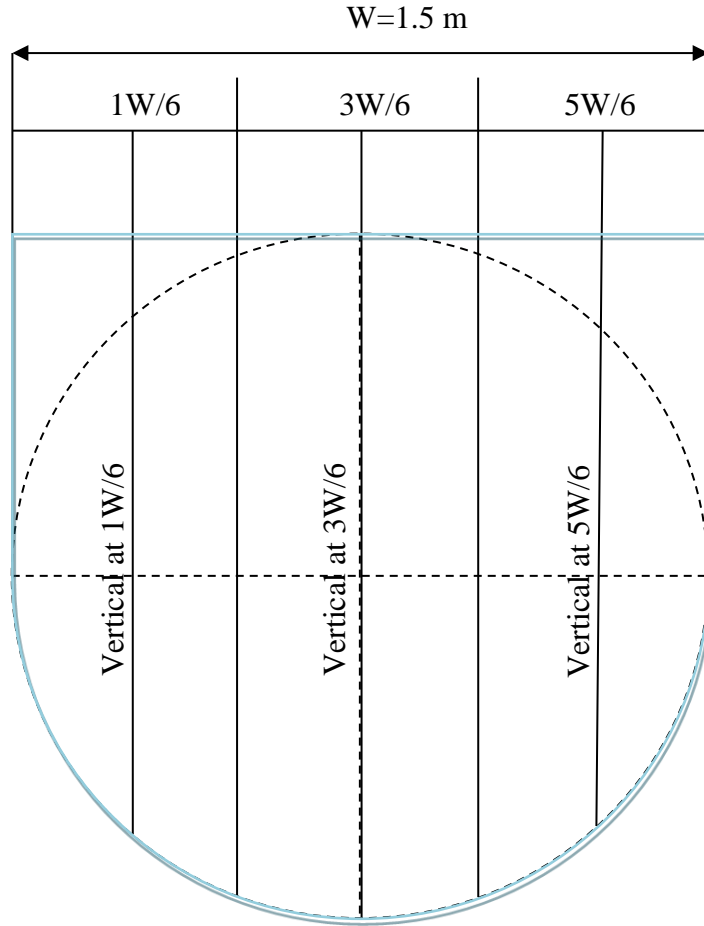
4: Sketch of Southwest Kano underground canal cross section
